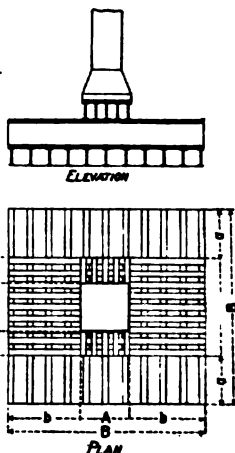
I-beam Footing for Independent (isolated) Piers. Beams to be imbedded in concrete.
